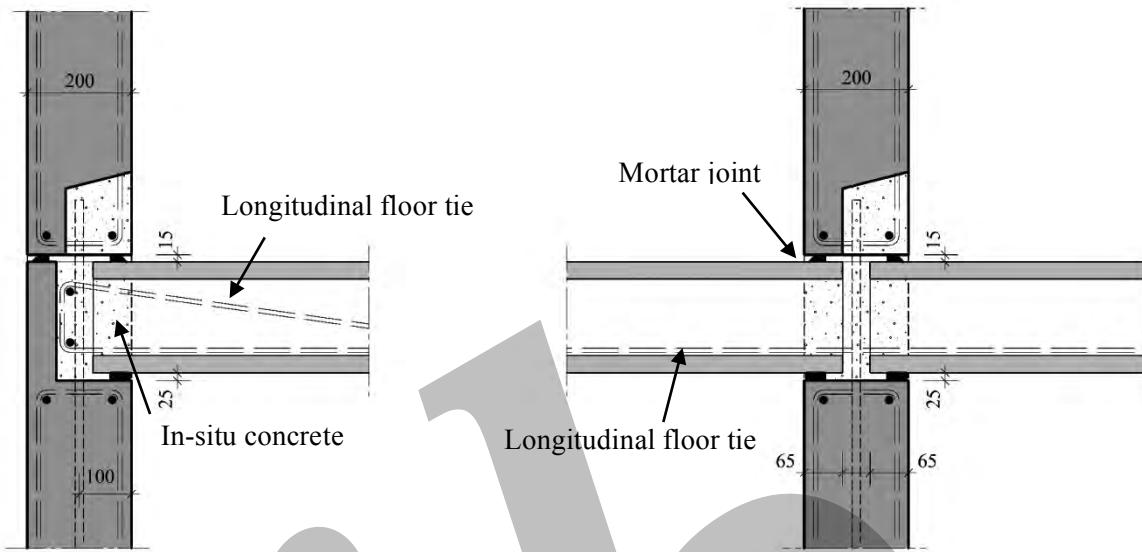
Wall-to-floor connections at intermediate load-bearing walls and hollow-core floor elements for building up to maximum 10 storeys.
